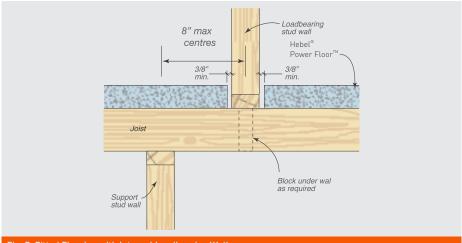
Fitted Flooring with Internal Loadbearing Wall.
